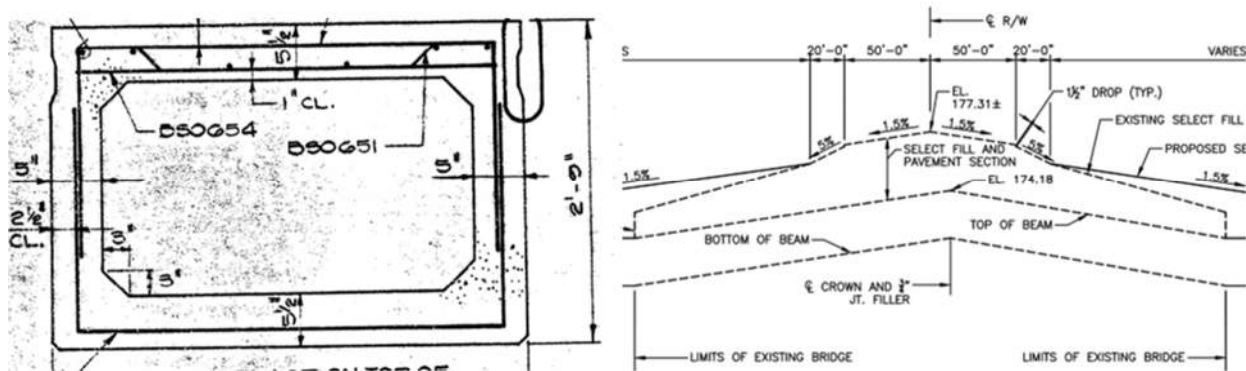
Box Beam Section and Soil Fill of Runway Bridge (Taxiway Bridge Similar).
